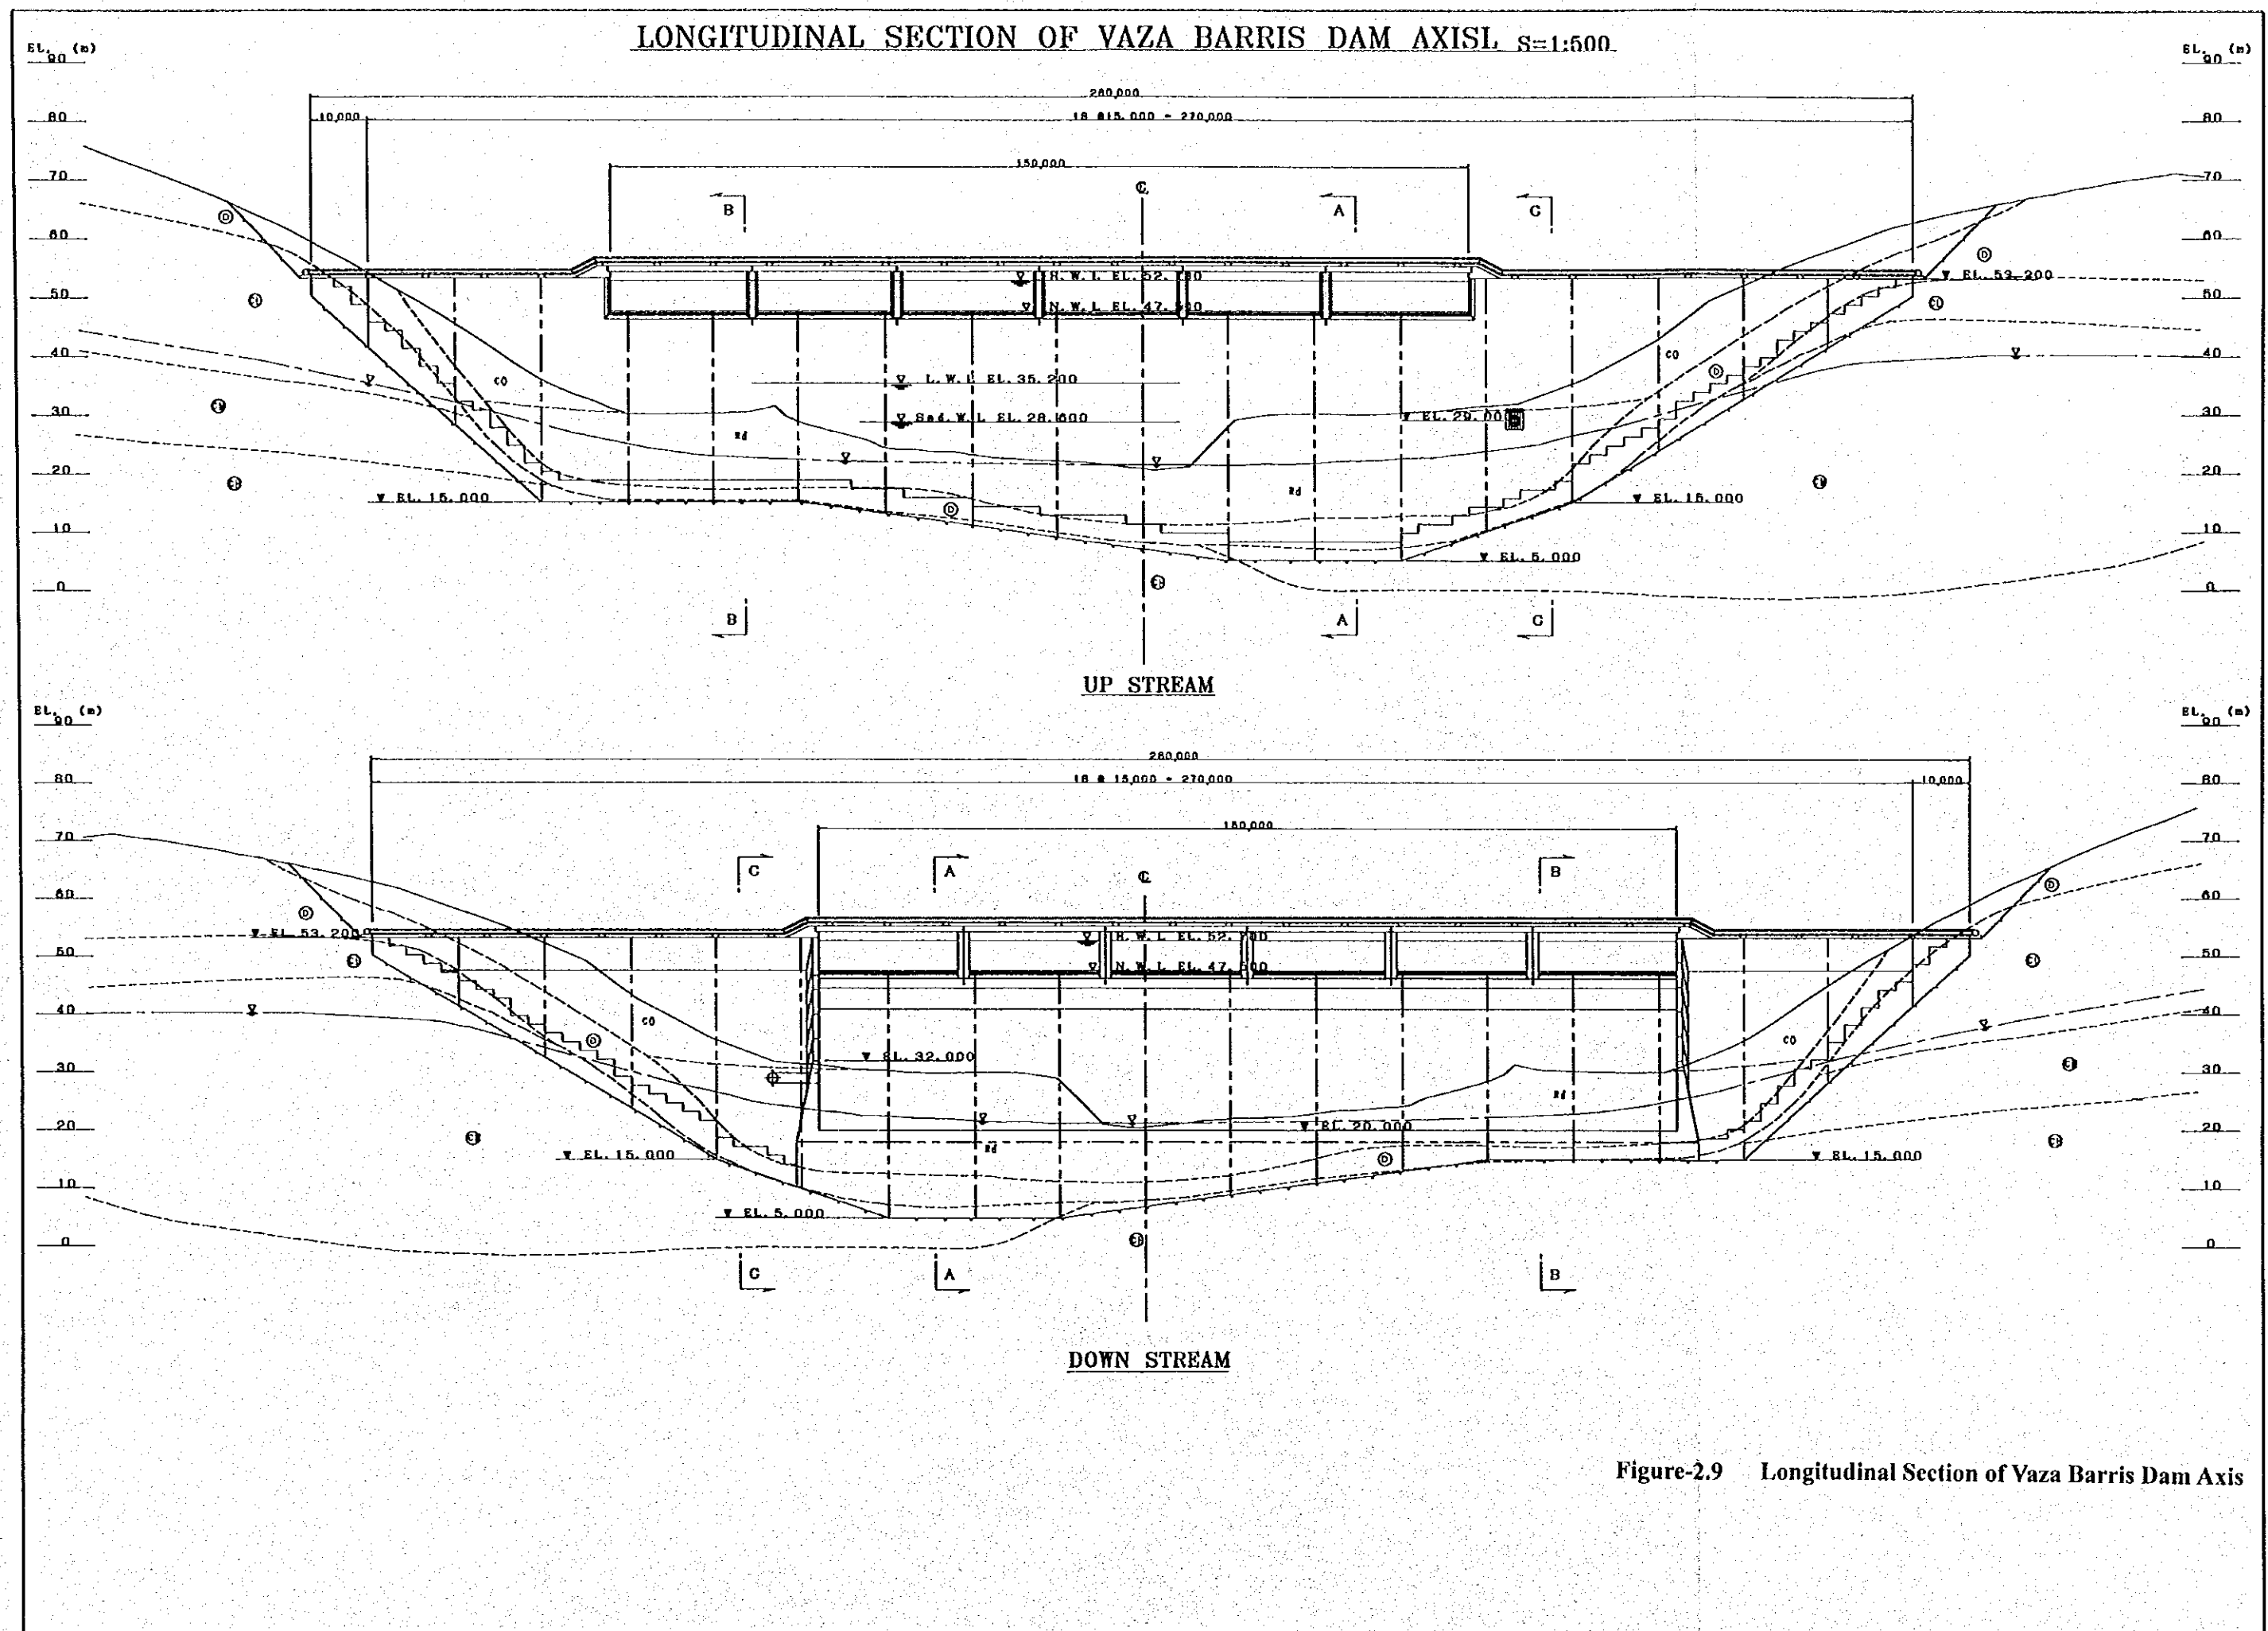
Longitudinal Section of Vaza Barris Dam Axis
